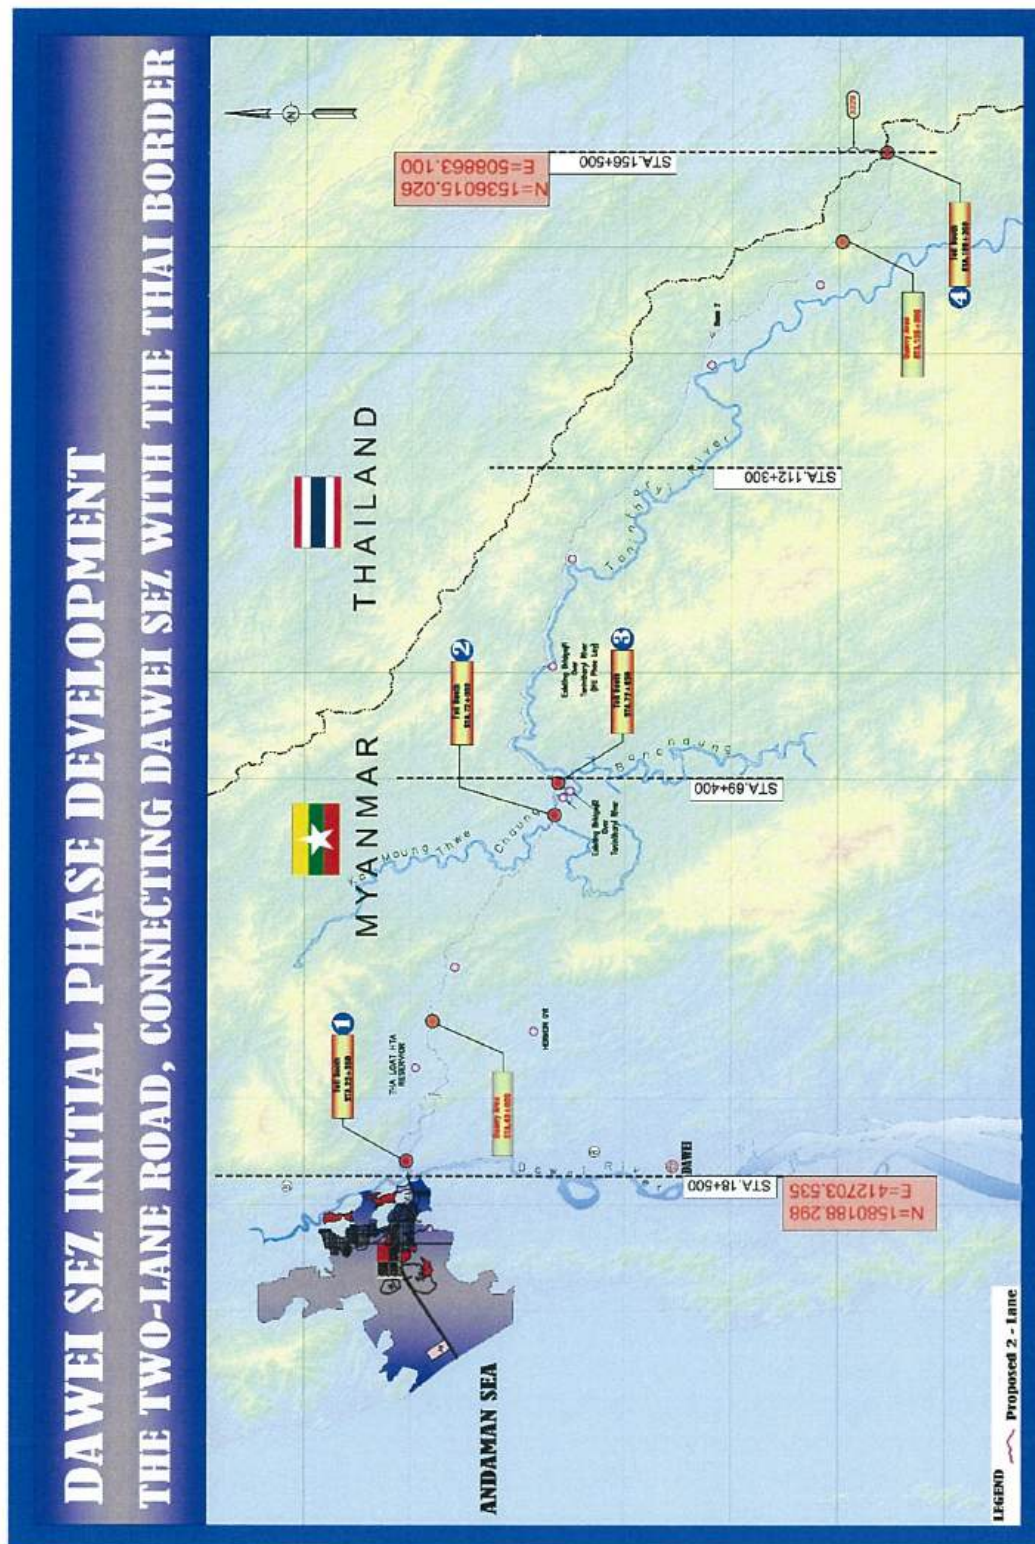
THE TWO-LANE ROAD ALIGNMENT ON THE EXISTING ACCESS ROAD
